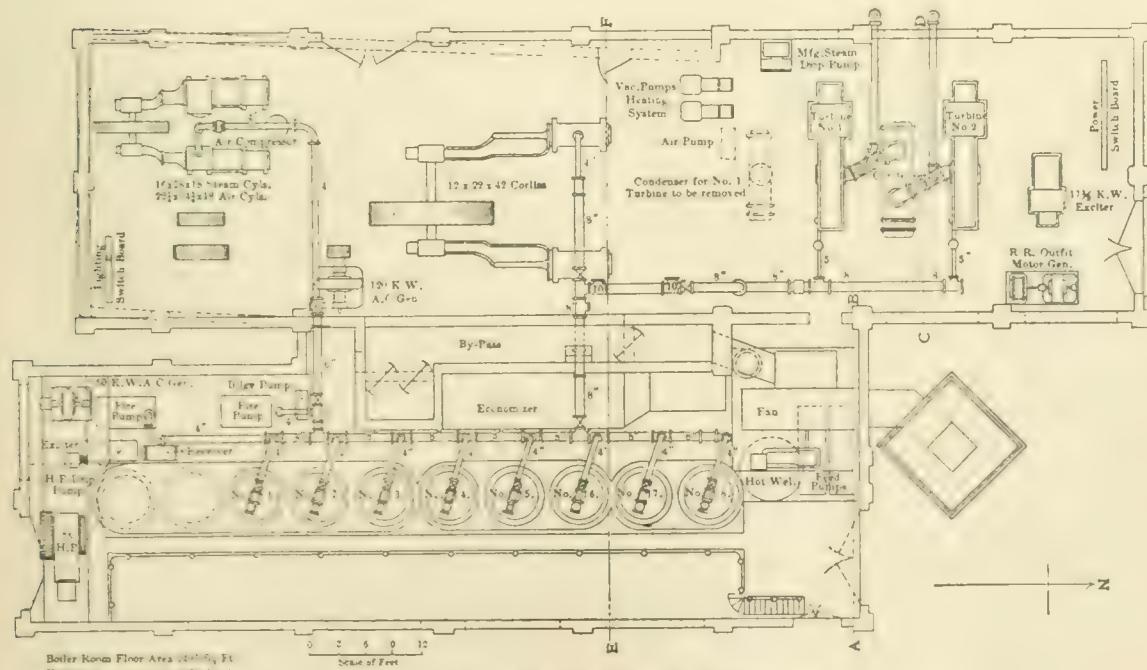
PLAN OF THE BOILER AND POWER-HOUSE.
